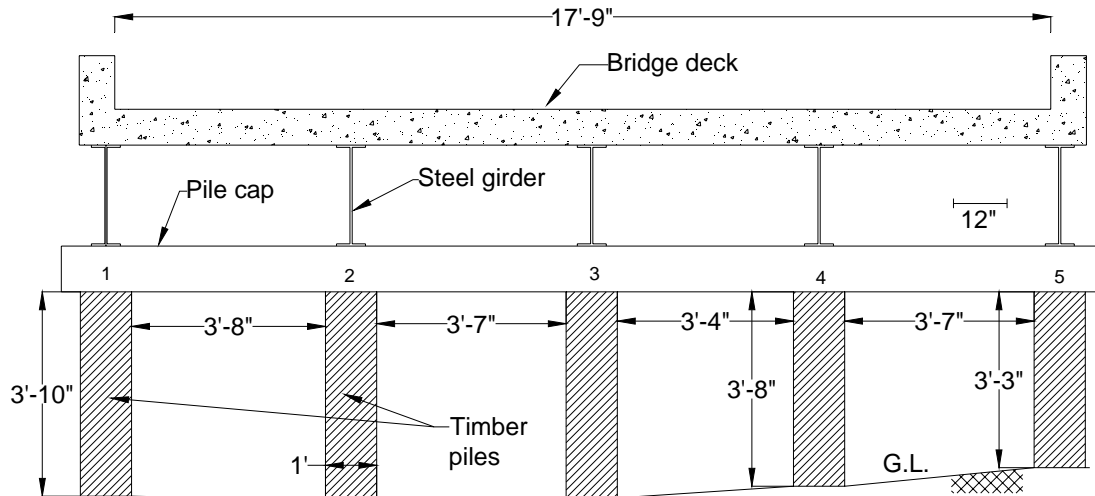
Schematic diagram of the southeast abutment (Bridge No. 237380 – Mahaska County)
